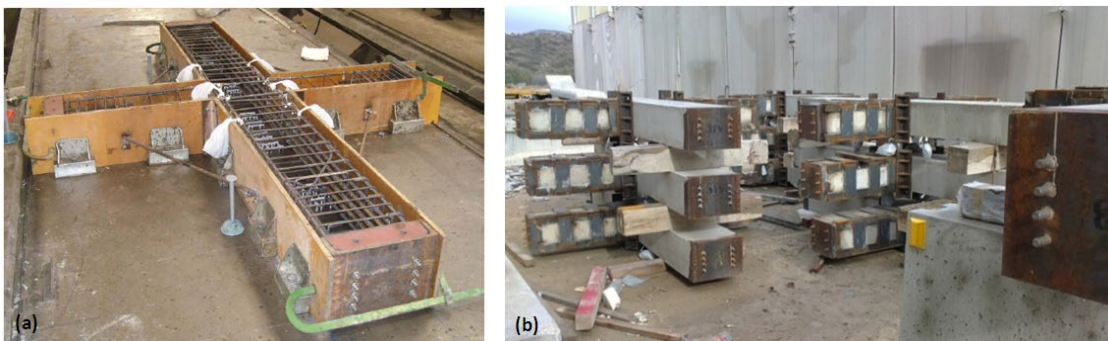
a) Specimen ready for concrete pouring, b) specimens strengthened with steel cage
